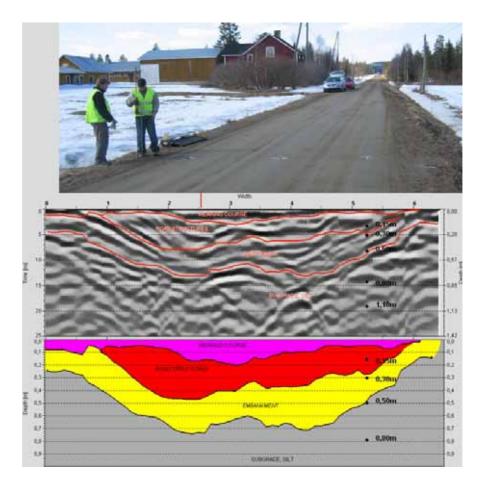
Kemijärvi test site, GPR cross section profile and its interpretation showing the road structure and the location of the Percostation probes. The road width at the test site is 6.4 m. Trucks with full loads are mainly using the left side of the road.
